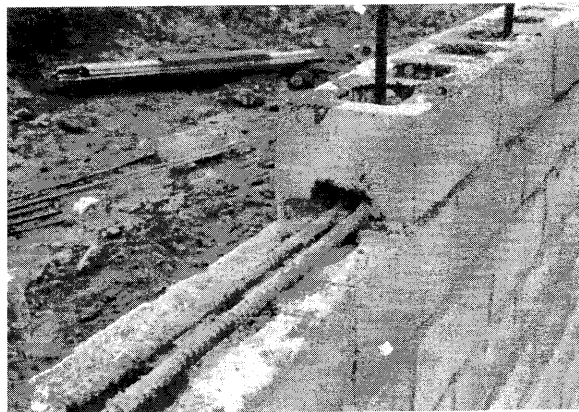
Pumping grout into reinforced concrete masonry wall. (Courtesy of Portland Cement Association)
